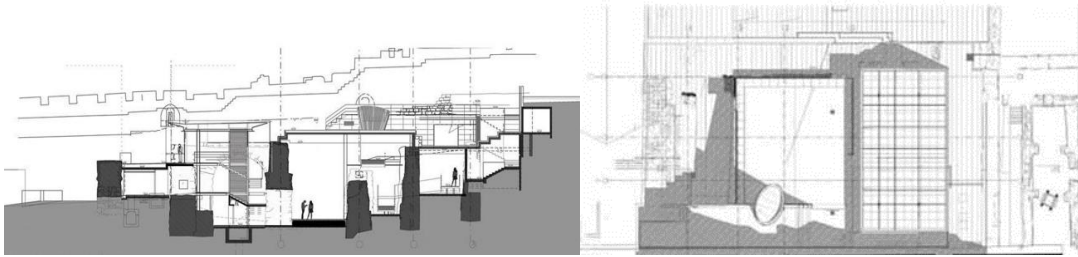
Underground planning of the museum (Source: Kimmel, 2011)
